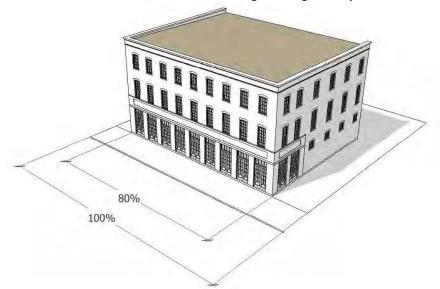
Minimum Building Frontage Occupation
